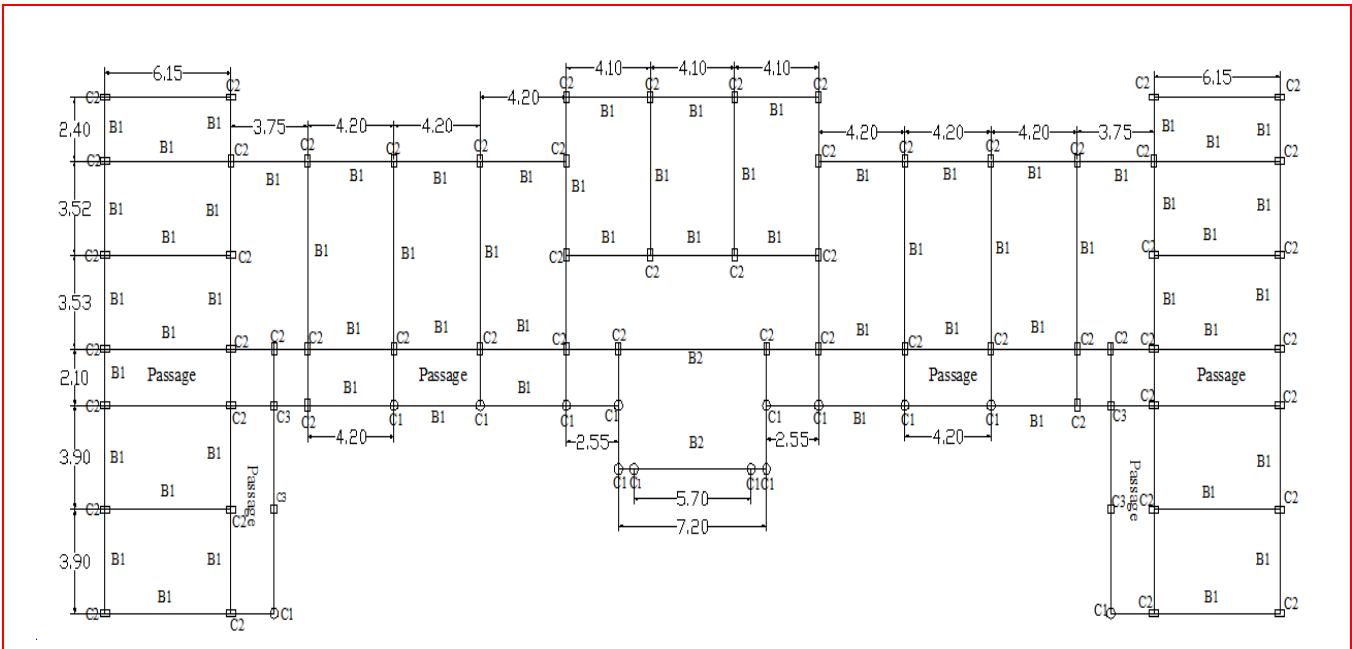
The plan of the Single-storey RC building (Model-4) (units in m).
